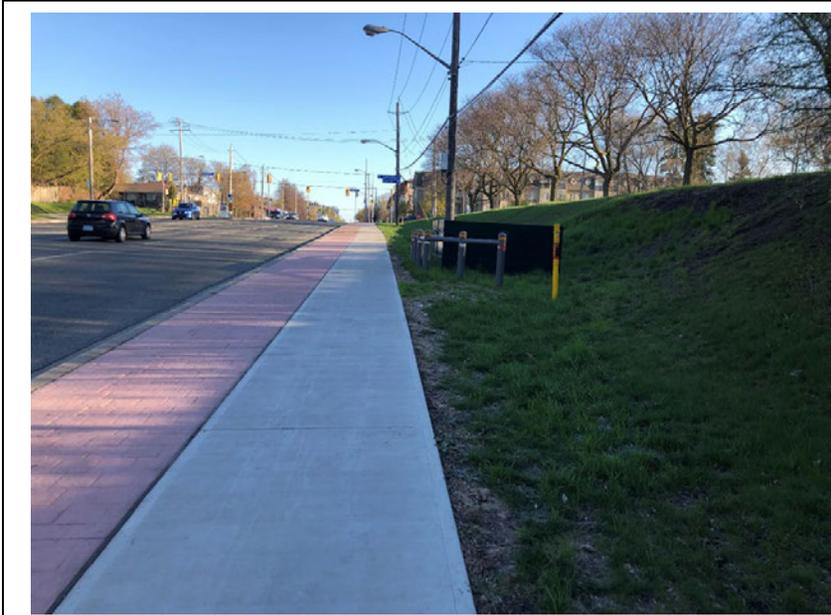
Tie-in and District Station on East Side of Bathurst St., South of Ellerslie Ave (looking north)
